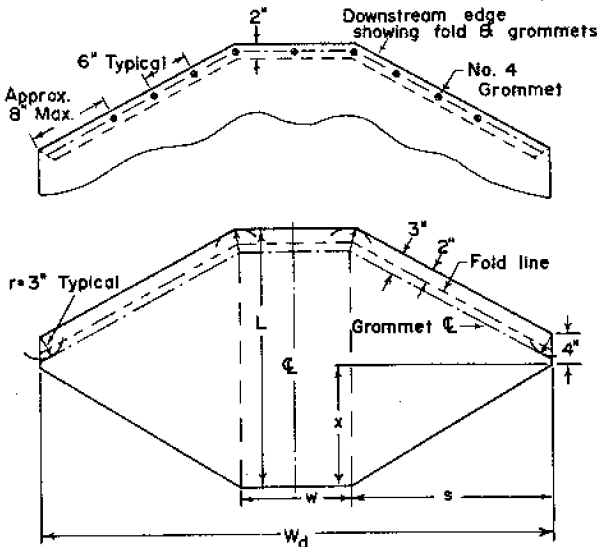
FLEXIBLE DAM DETAIL FOR DRAWSTRING CHECK
